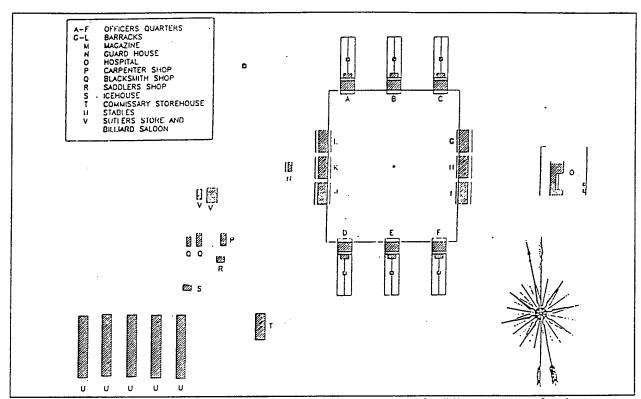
Layout of Fort Riley, Kansas, showing the typical arrangement of buildings at western frontier posts.
